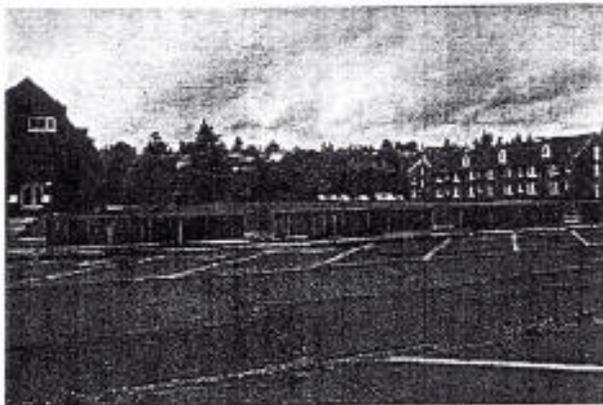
Wooden screens in parking east of Building 26 North and South
